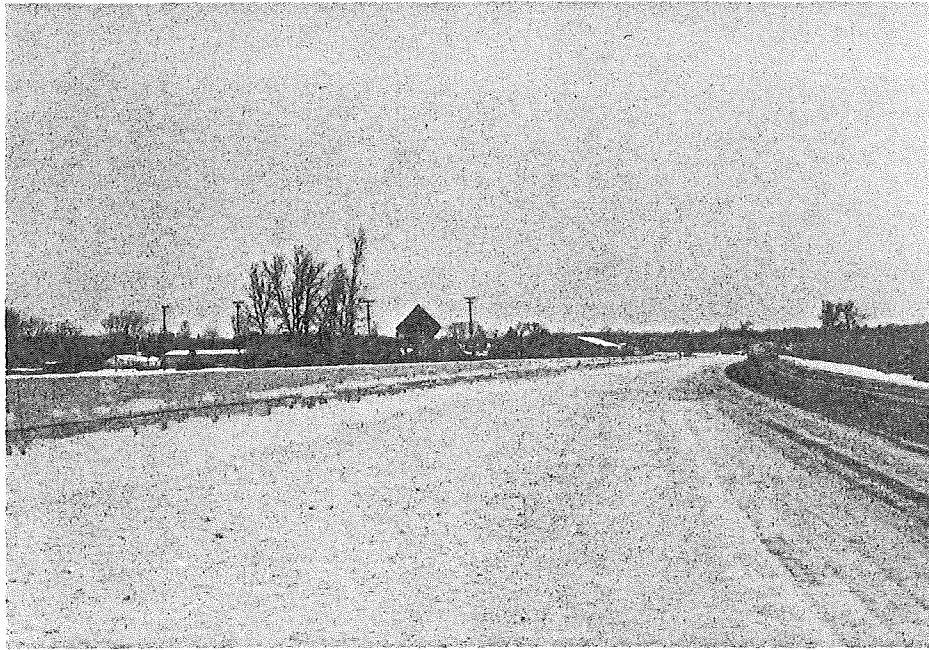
Concrete glare screen provides a 51 inch wall height (I-75 near Saginaw).
